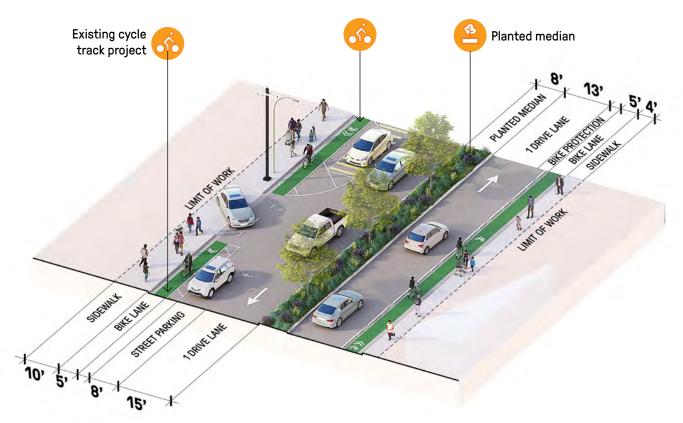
EAST MARKET STREET AND TOWT STREET INTERSECTION - FOCUS AREA VISION
